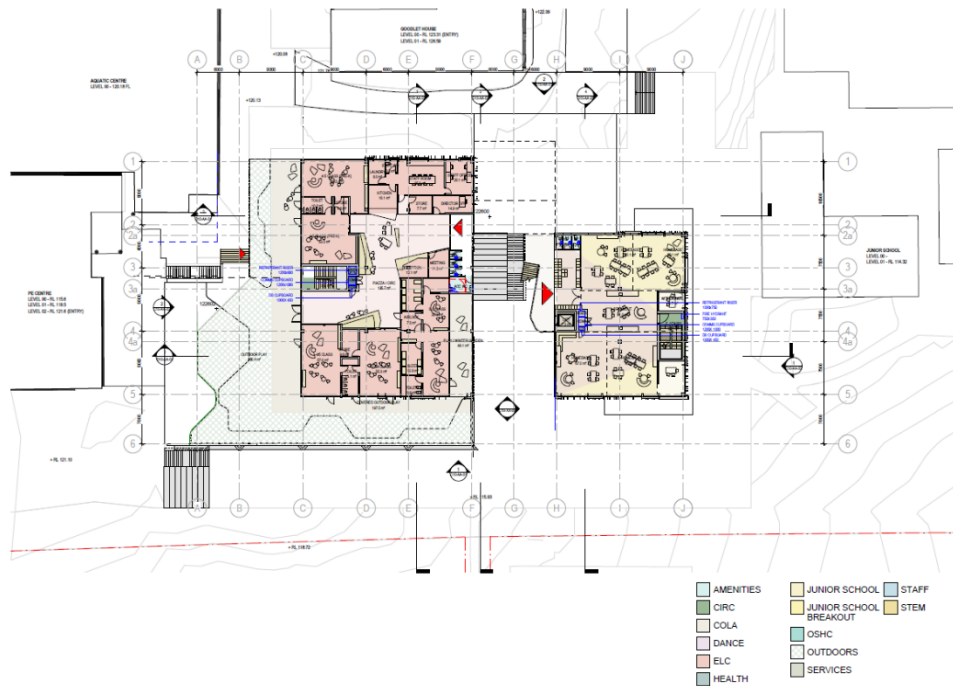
Proposed General Arrangement Plan - Level 02. (Source: BVN)
